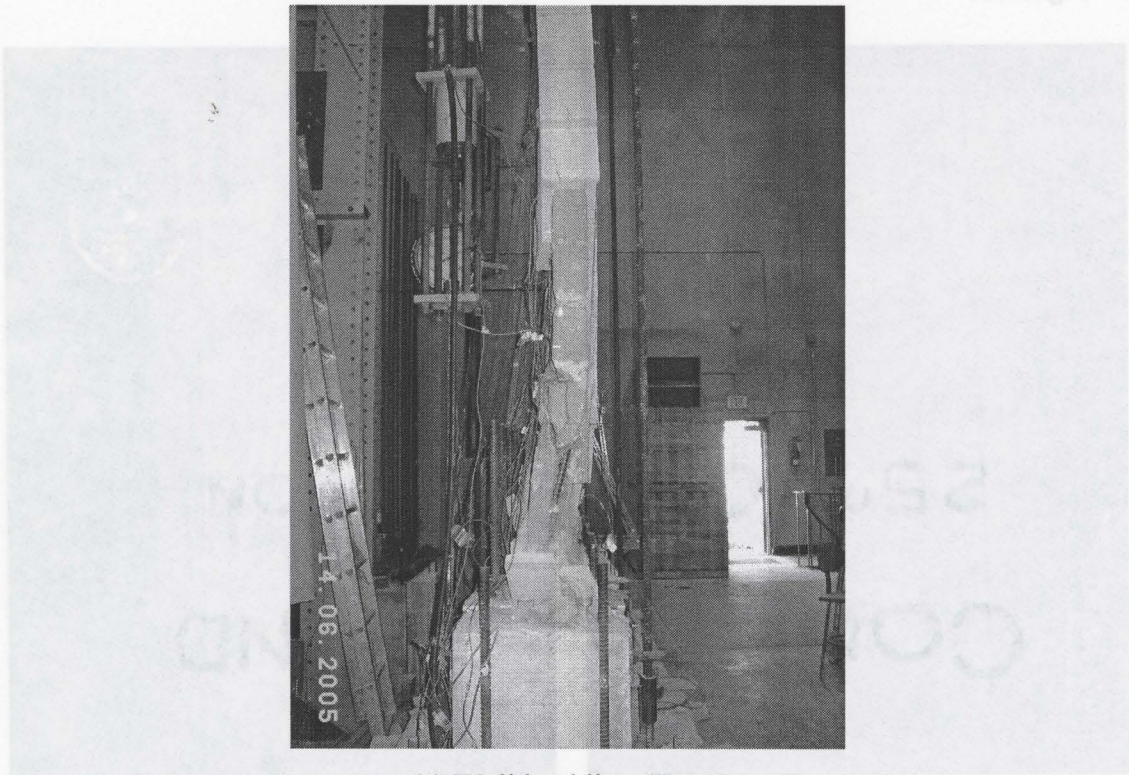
73: Spalling of face shells along one side of Wall 6 at 45 mm top deflection
